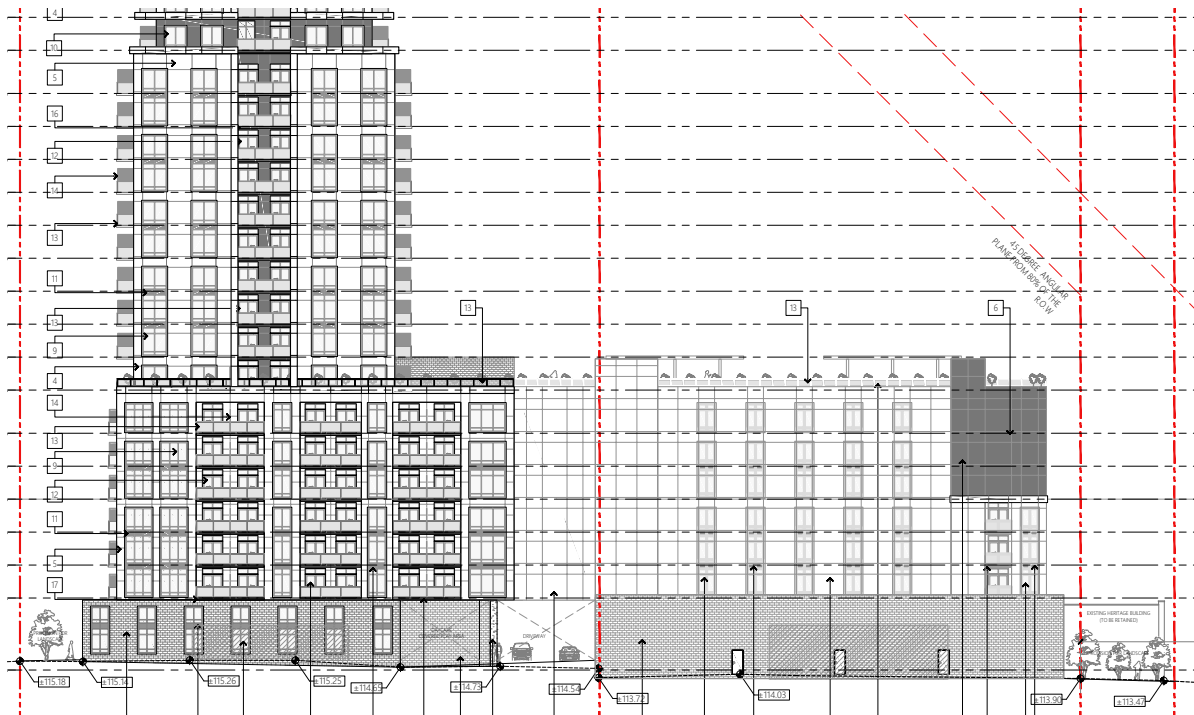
Excerpt of proposed west elevation (RA Lumbao Architects, 2025).
